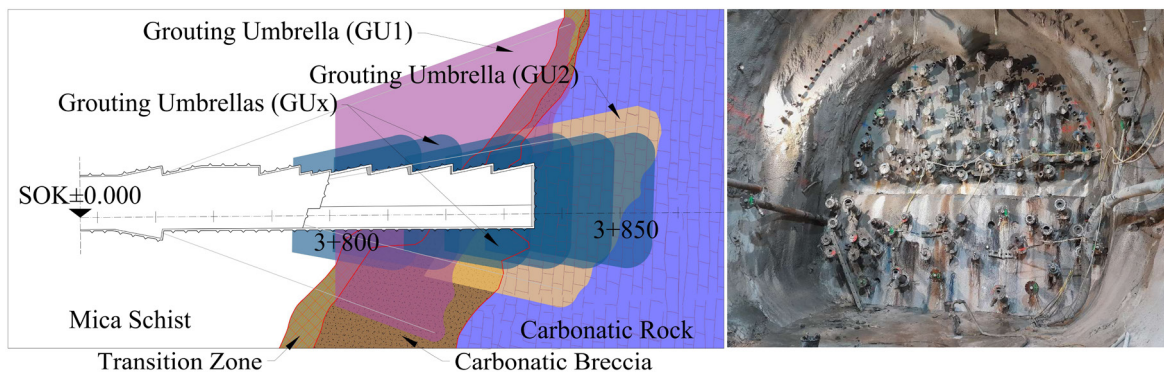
Grassberg Northern Fault Zone (GNFZ), track 2 - overview over excavation and grout concepts (left), Face at chainage 3800 after completed grouting work (right).
